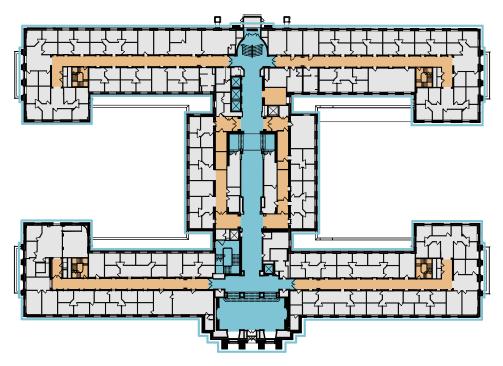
Eccles Building Level 01 preservation zone diagram.
